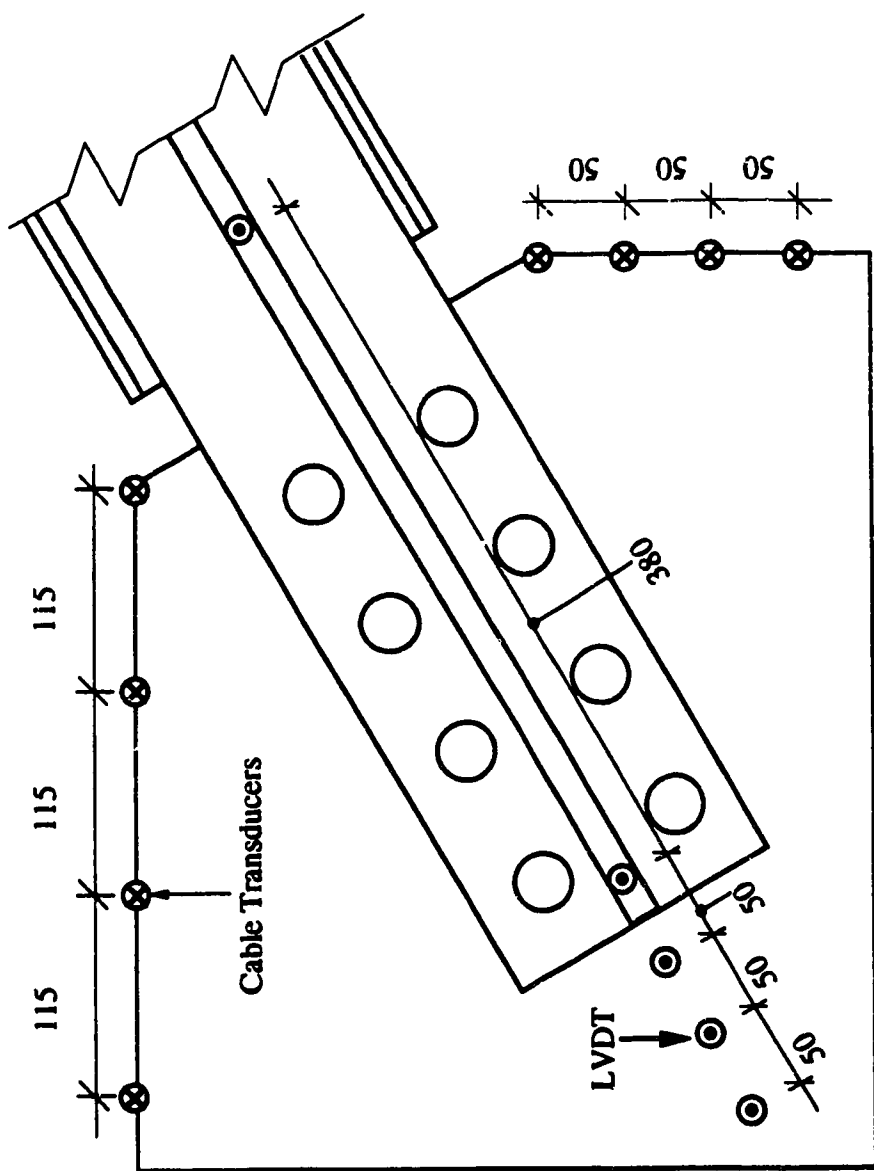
Schematic of Cable Transducers and LVDTs Location for AP Type Specimens
